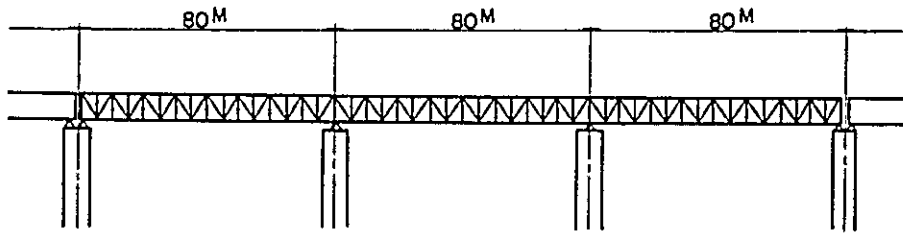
(1) SECTIONAL VIEWS OF 3-SPAN CONTINUOUS TRUSS
